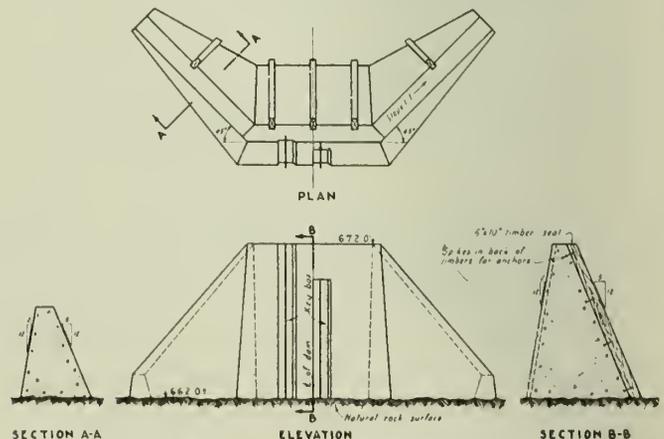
Wing Walls at Junction of Concrete and Earth Fill Sections.
